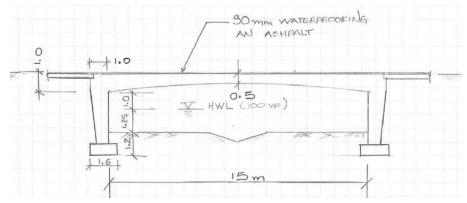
Conceptual Cross-Section for Structural Alternative 2B - South Structure
